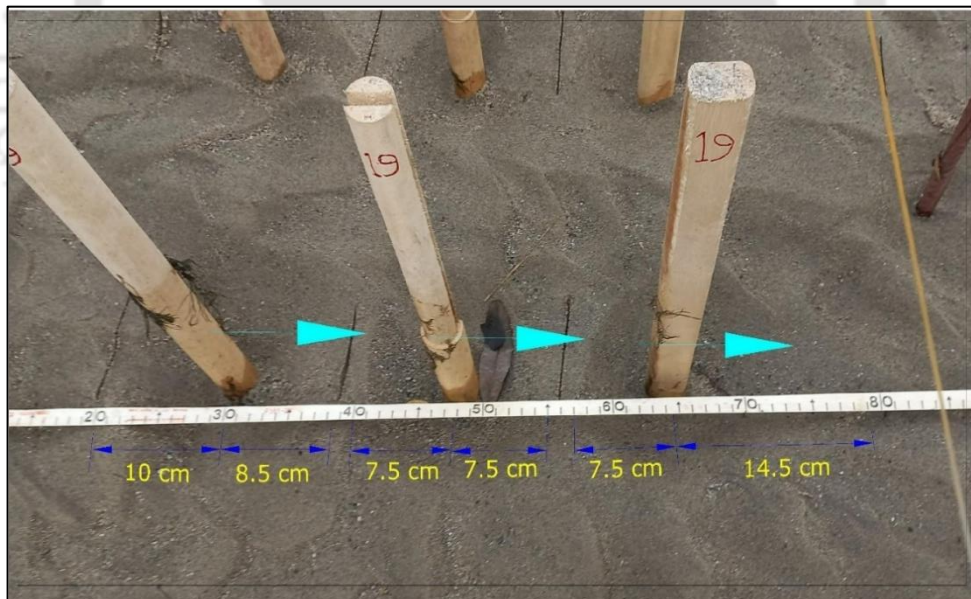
Photo of scour hole around pier no. 19 of bridge near Tezpur
